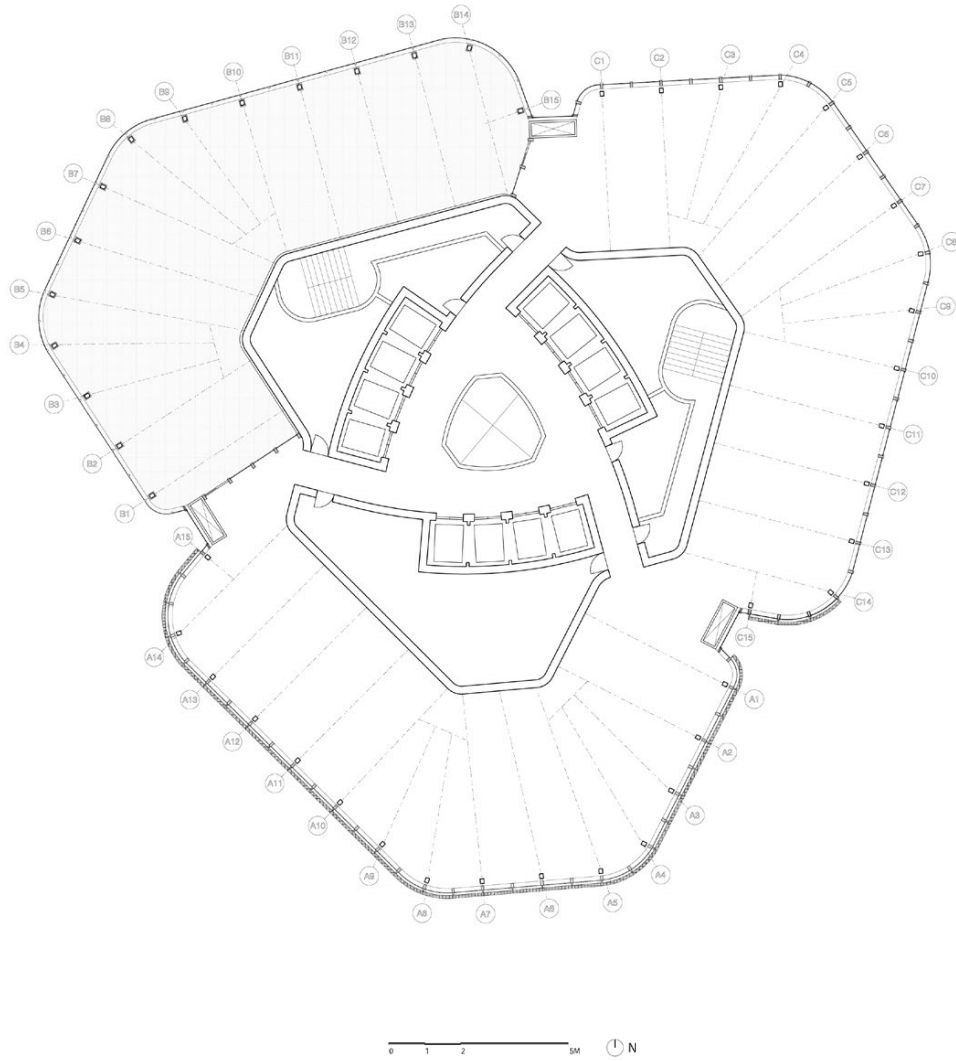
Typical plan showing the introduction of an outdoor terrace.
